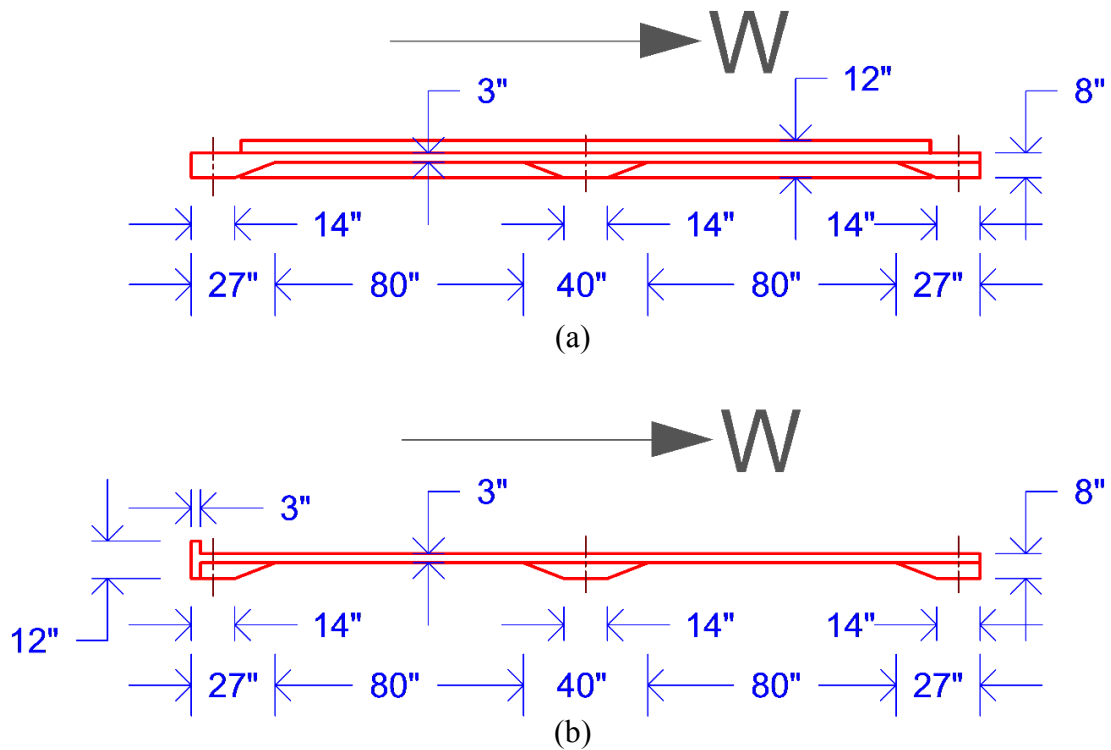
Elevation view of the sections from Figure 3.2, (a) section 1-1, and (b) section 2-2.
